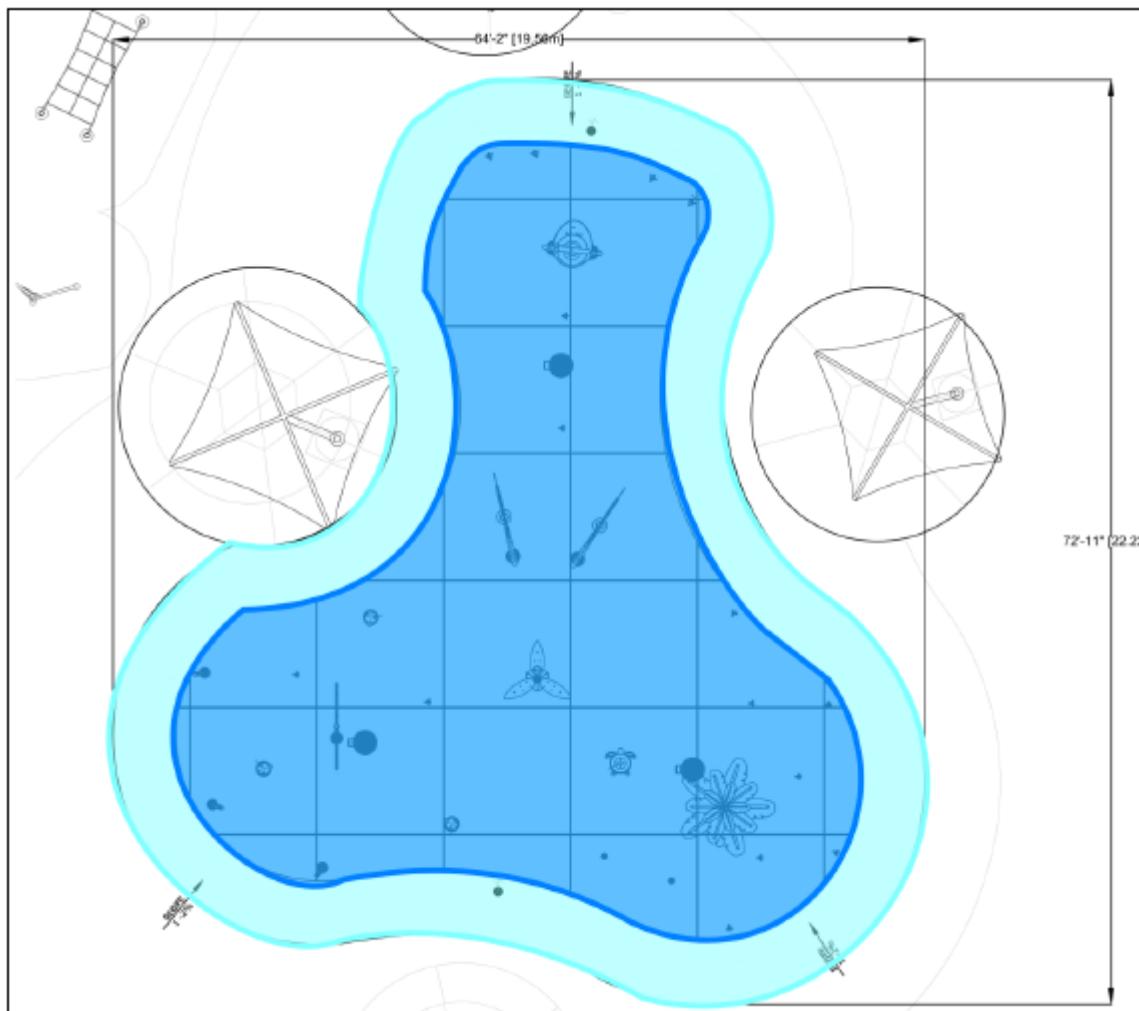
Plan view of 3,800 sq ft splashpad at Legends Park in Reedsburg WI
